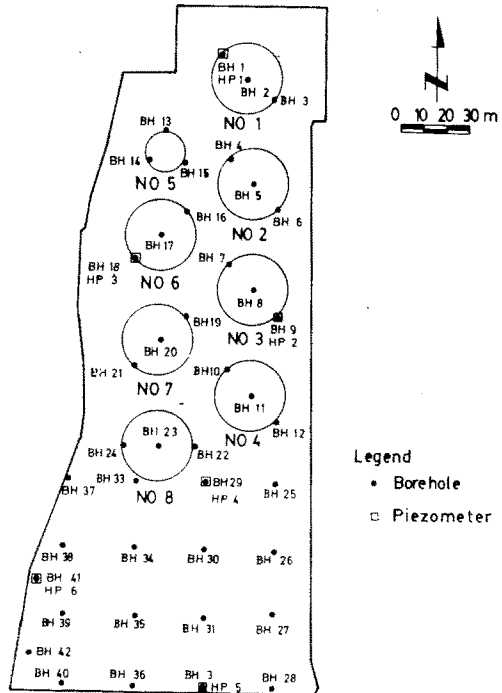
Site Plan of Yung Kong Oil Tank Terminal
